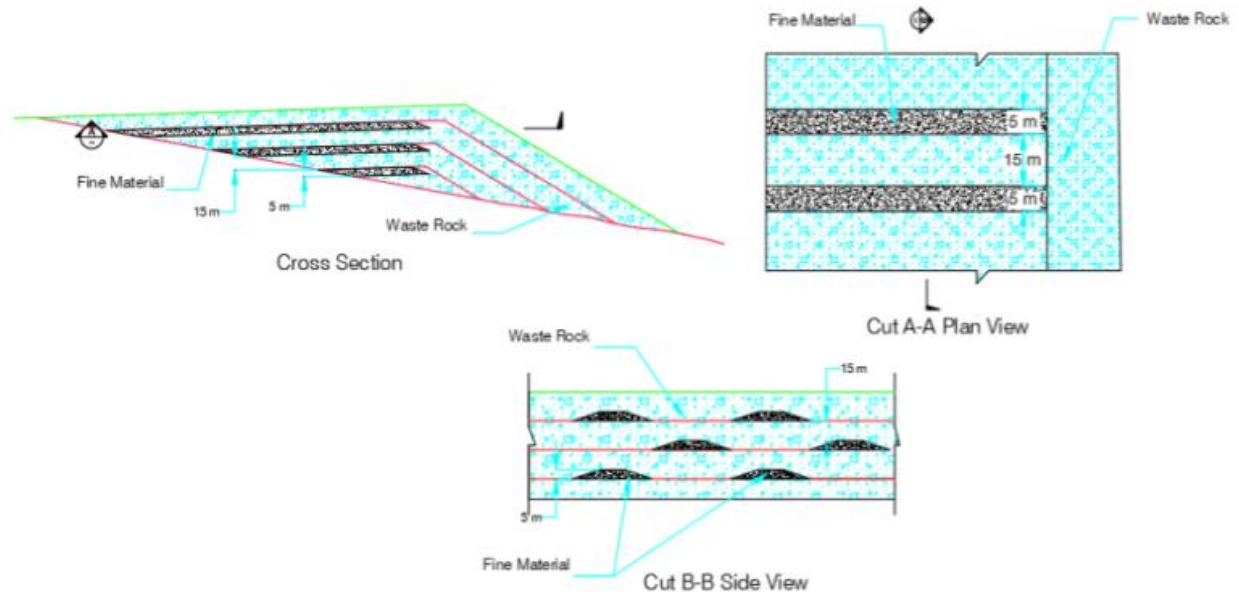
Cross-section, plan and side view for the proposed co-deposition method.
